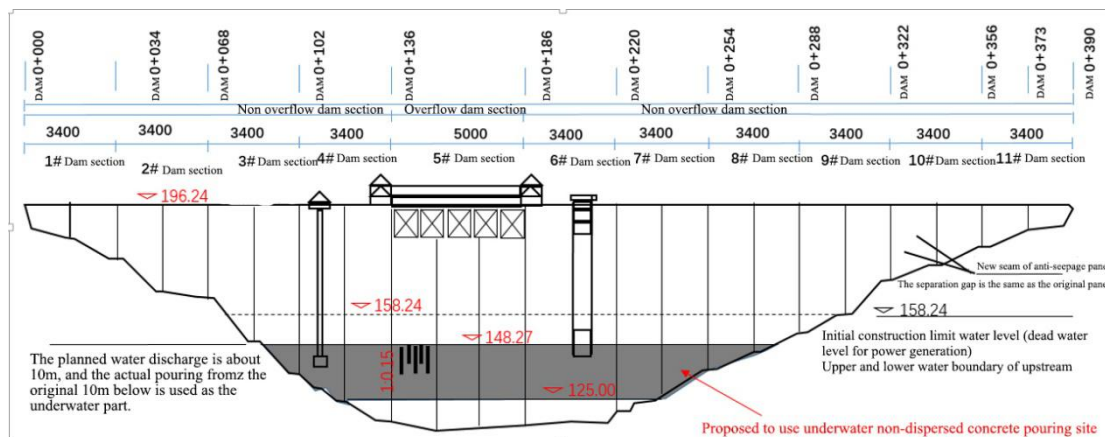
Vertical view of underwater concrete restoration on the upstream side of Wanyao Dam.
